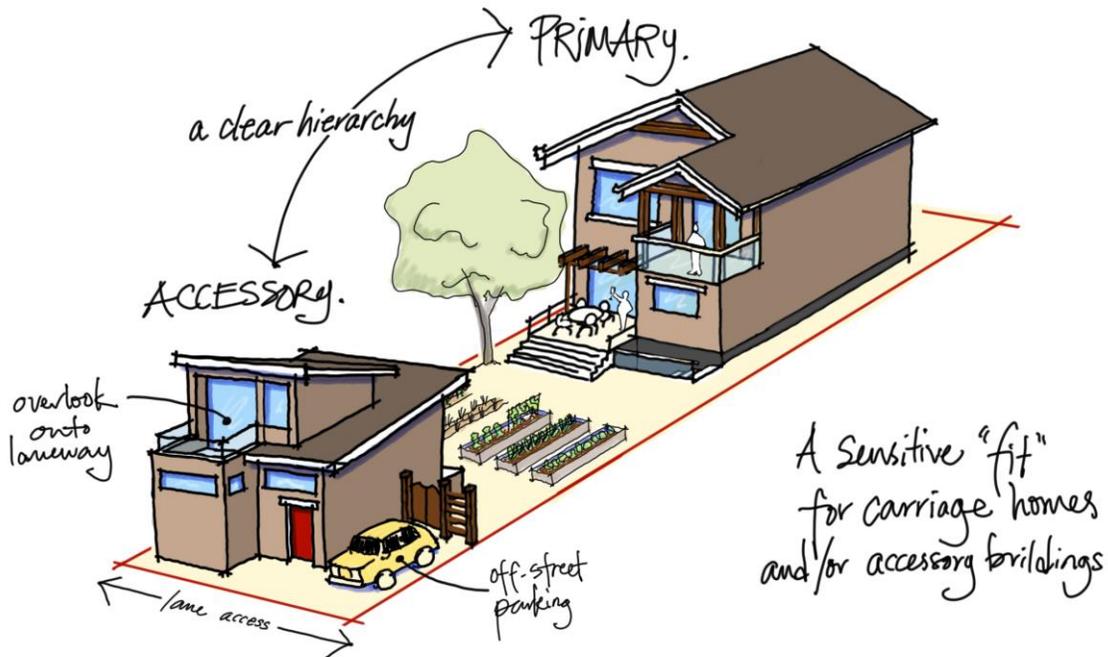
Arrangement of dwellings to create a sensitive fit for carriage homes and/or accessory buildings.
